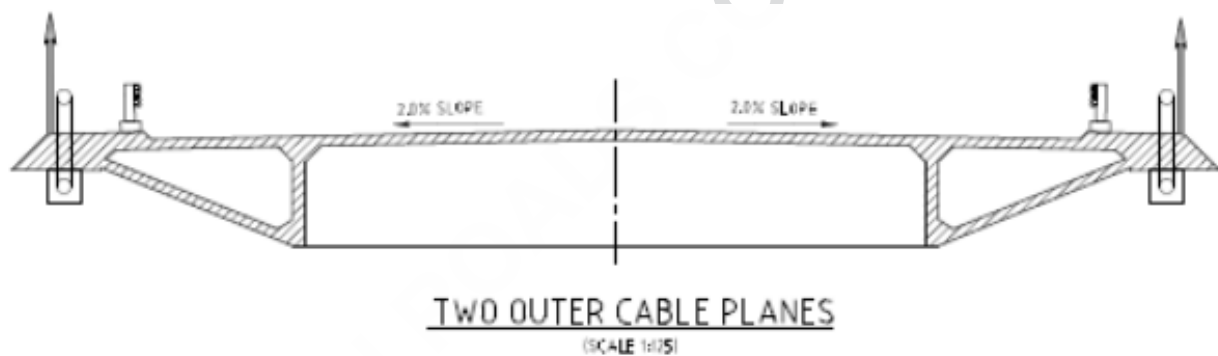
Typical Connection between side cables and deck through slabs
